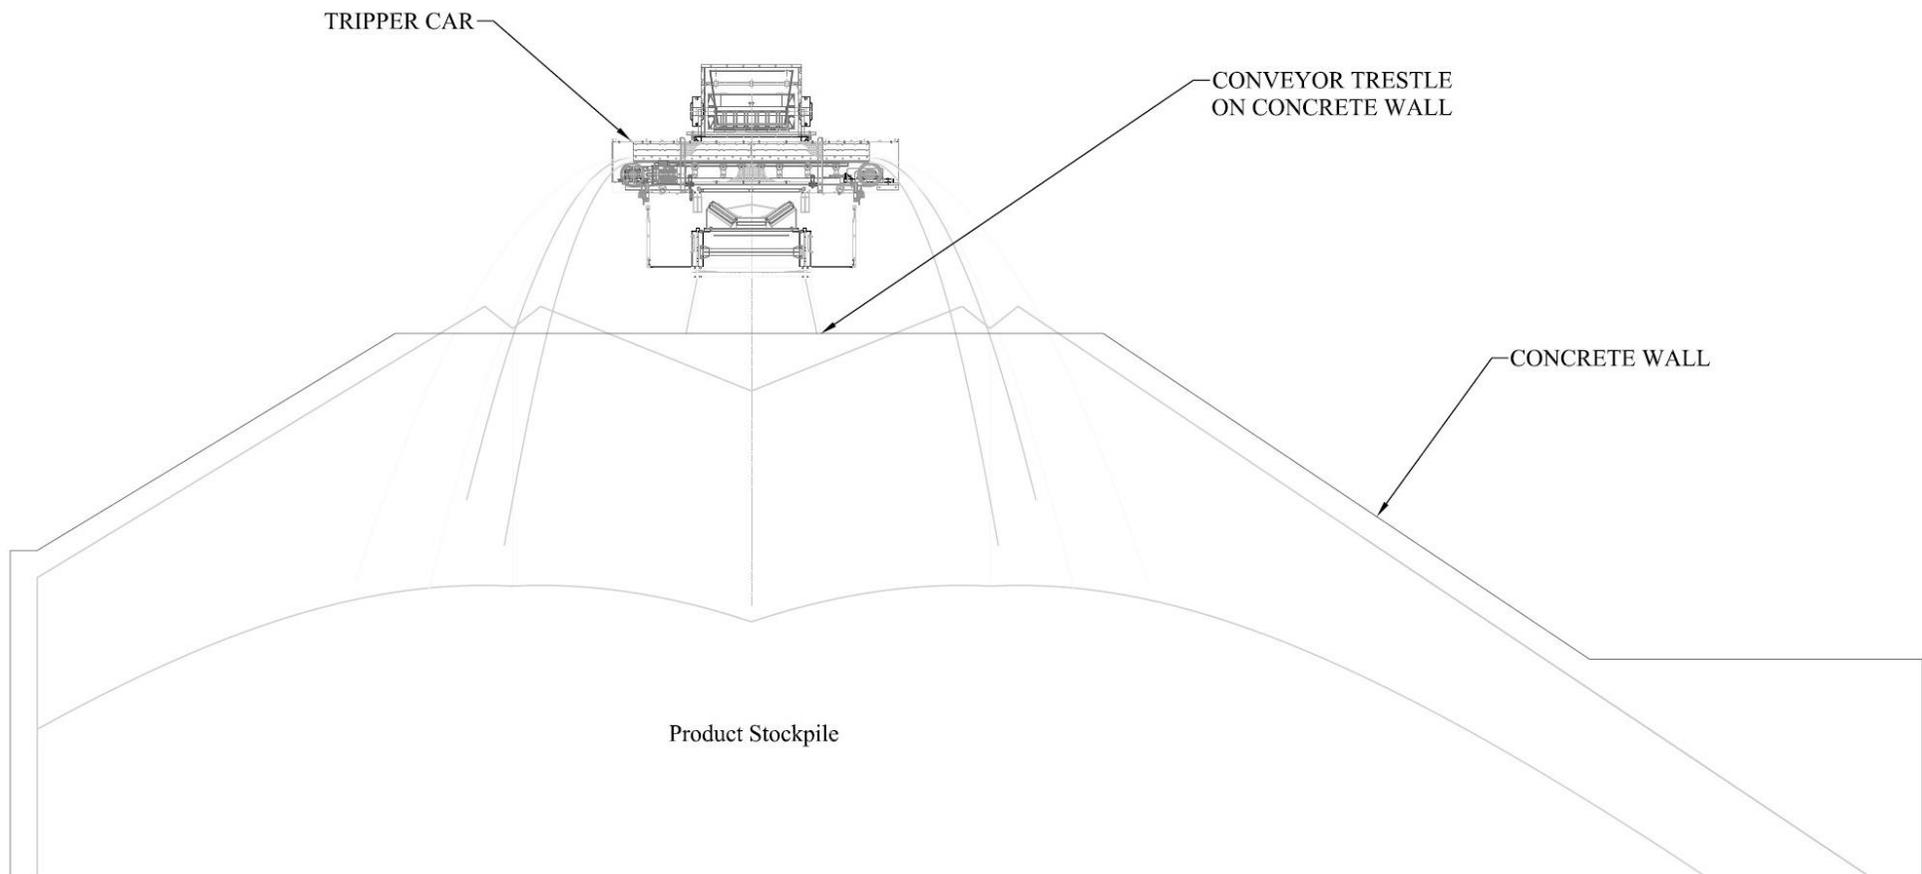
Cross section of proposed handling facility bunker – St Peters Terminal
